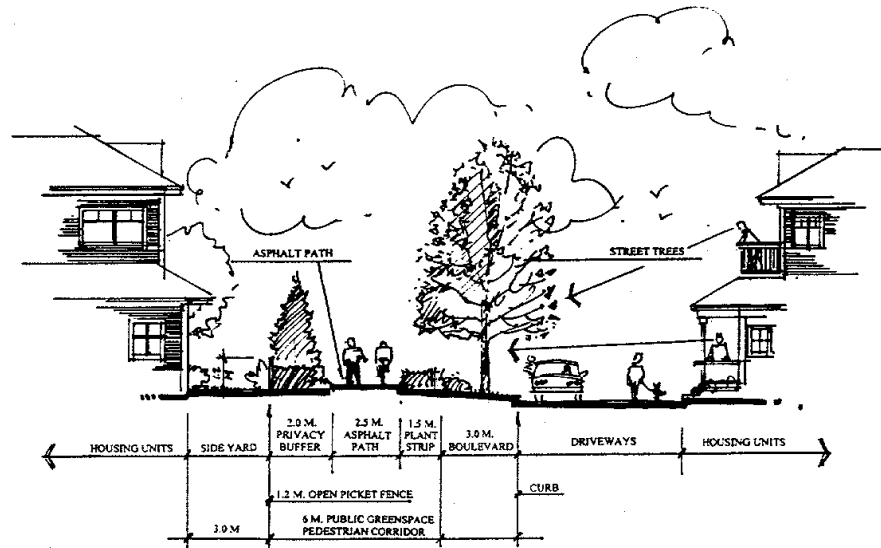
CROSS SECTION - PATHWAY & GREENSPACE ALONG INTERNAL ROADS (Scale: 1:250)
